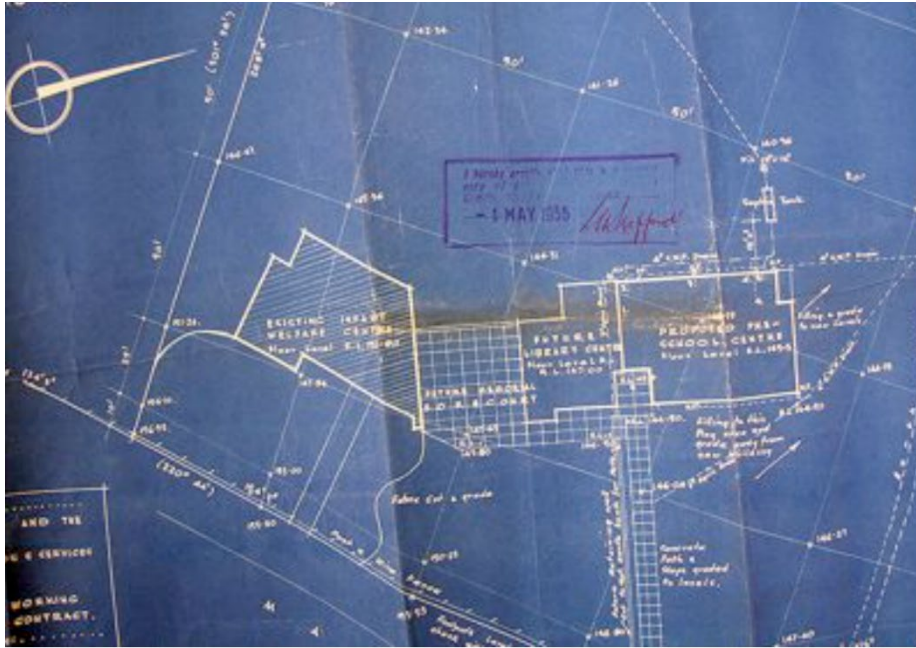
Sketch site plan dated 1956, showing amendments to postpone construction of the library and reductions to spaces in the Pre-School building. (Source: Public Building Plans File No.5841 Plan No.4057, Unit 413, VRPS 8044, PROV, cited in Mills and Westbrooke 2010:13)
